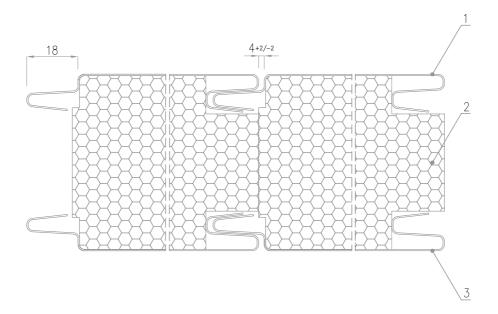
IzoWall MWF / EPS - wall sandwich panel with visible fastening, mineral wool core (MWF) or expanded polystyrene (EPS)
